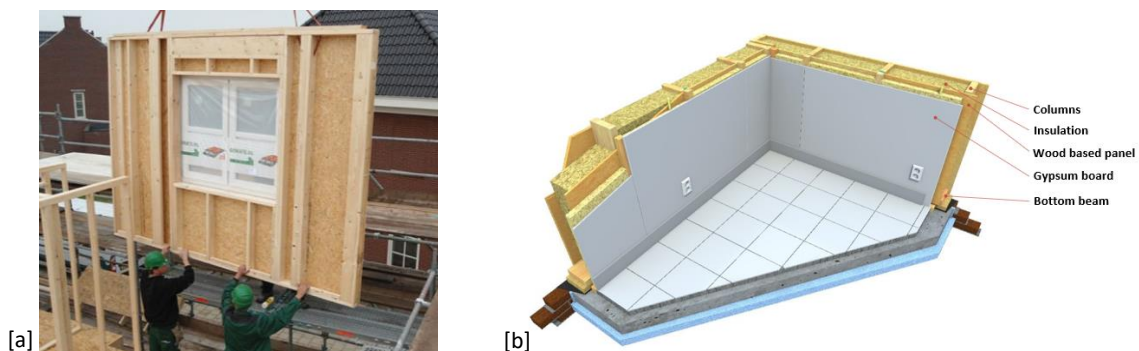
[a] HSB-wall construction (De Kroon Prefab, 2022); [b] Wall build-up (Passiehuismarkt, 2018).
